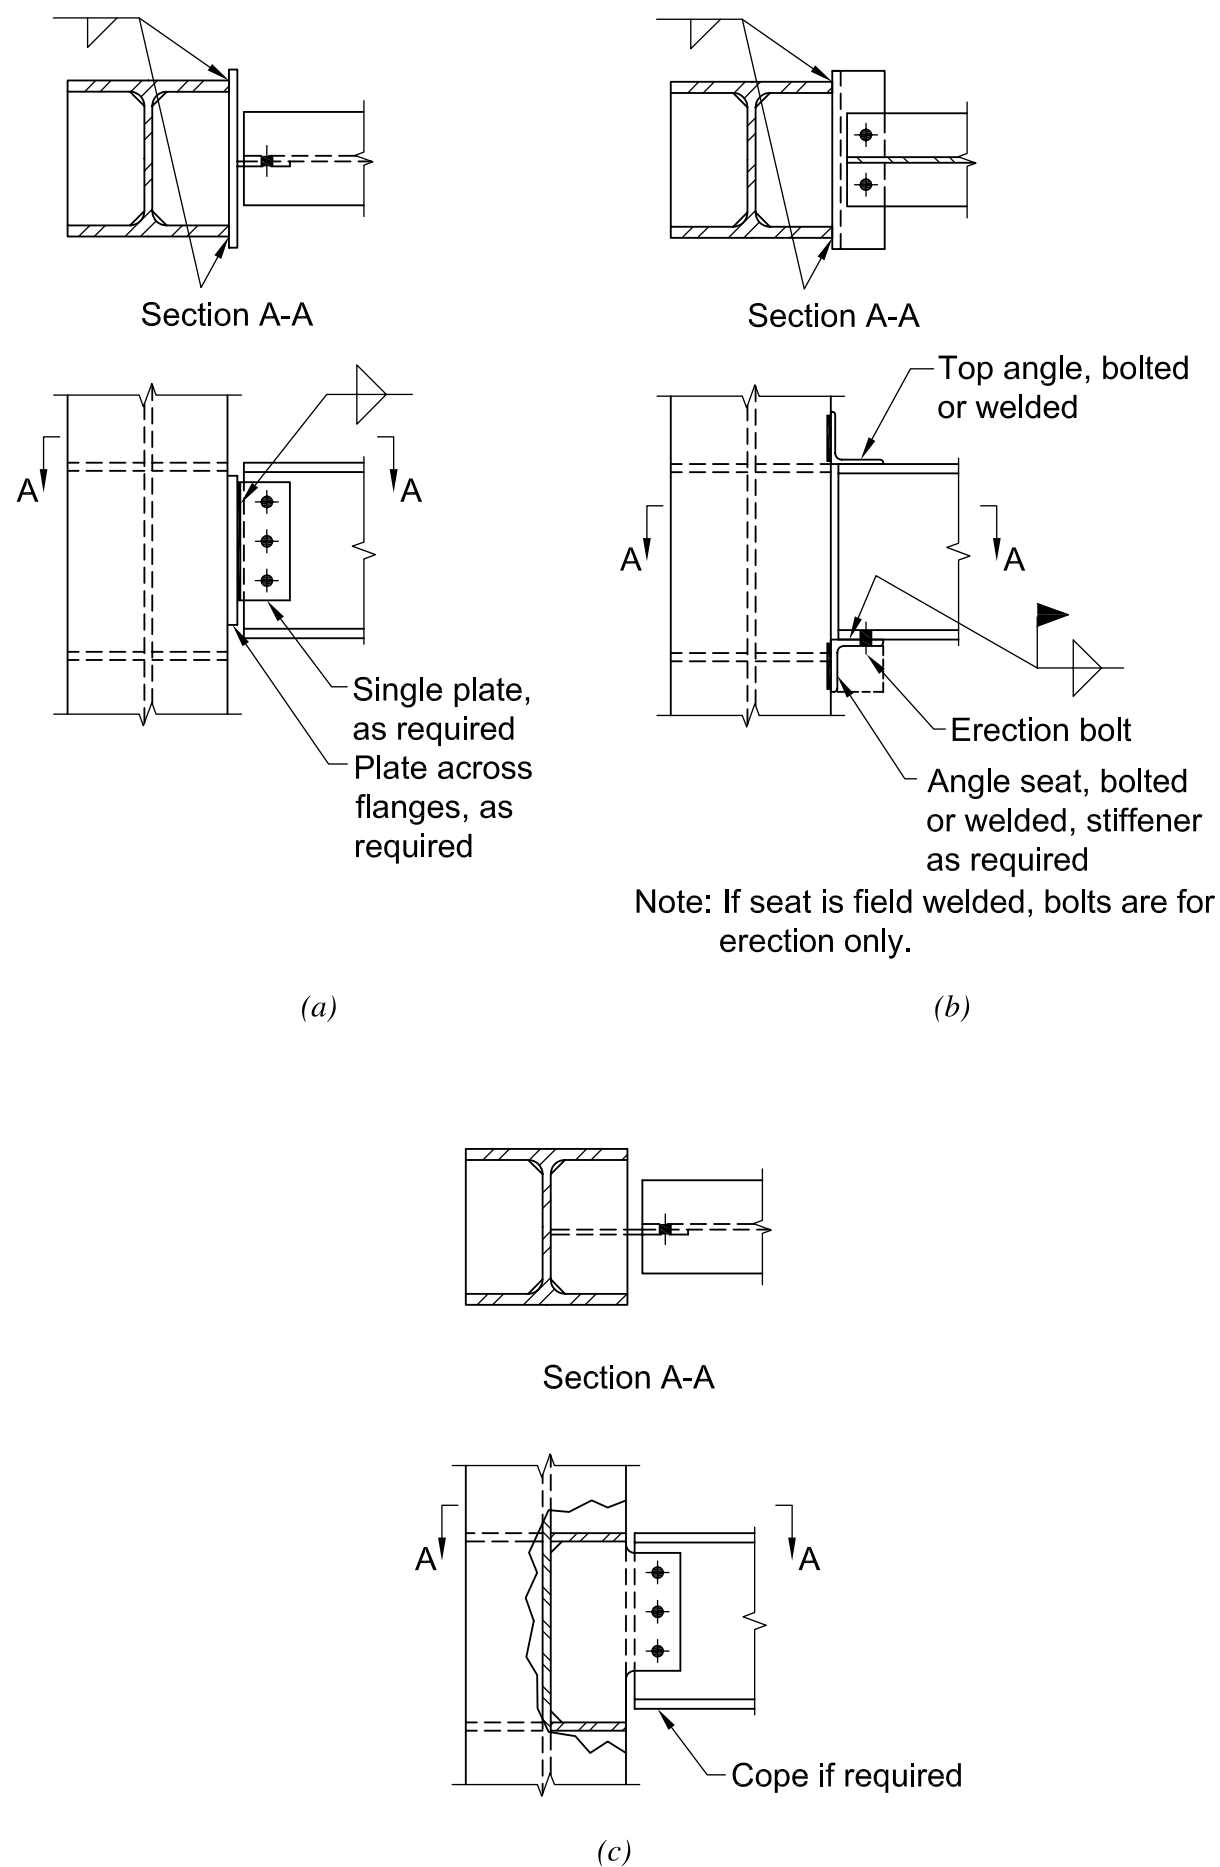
Simple shear connections at stiffened column-web locations.
